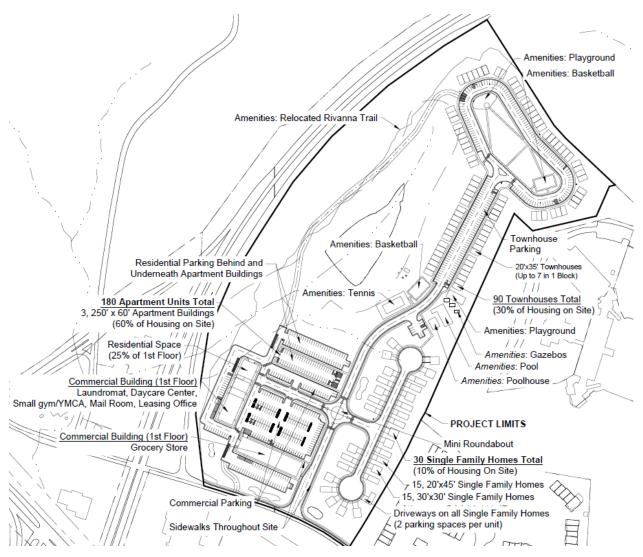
Dewberry Project Requirements Summarized on Site Plan
